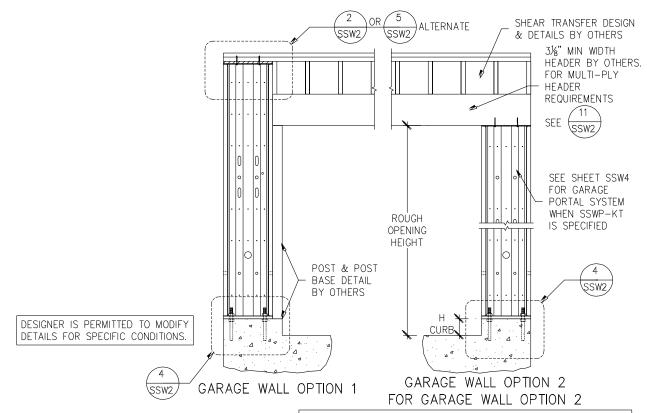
STEEL STRONG-WALL DETAILS (Continued) (4/SSW2)
